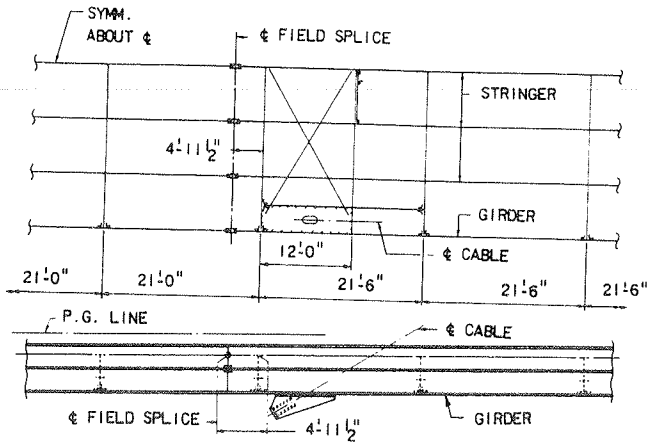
Steel alternative: plan and elevation of deck framing at cable anchorage.
